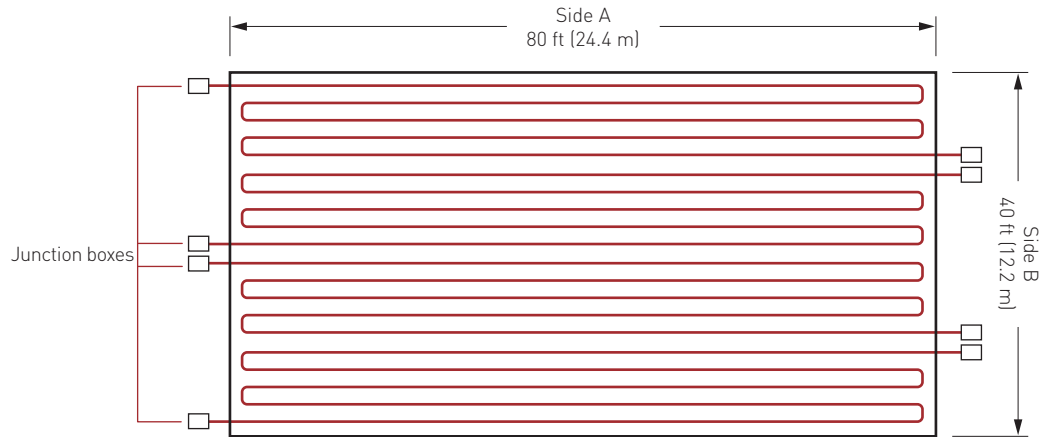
Typical heating cable layouts for heat loss replacement
